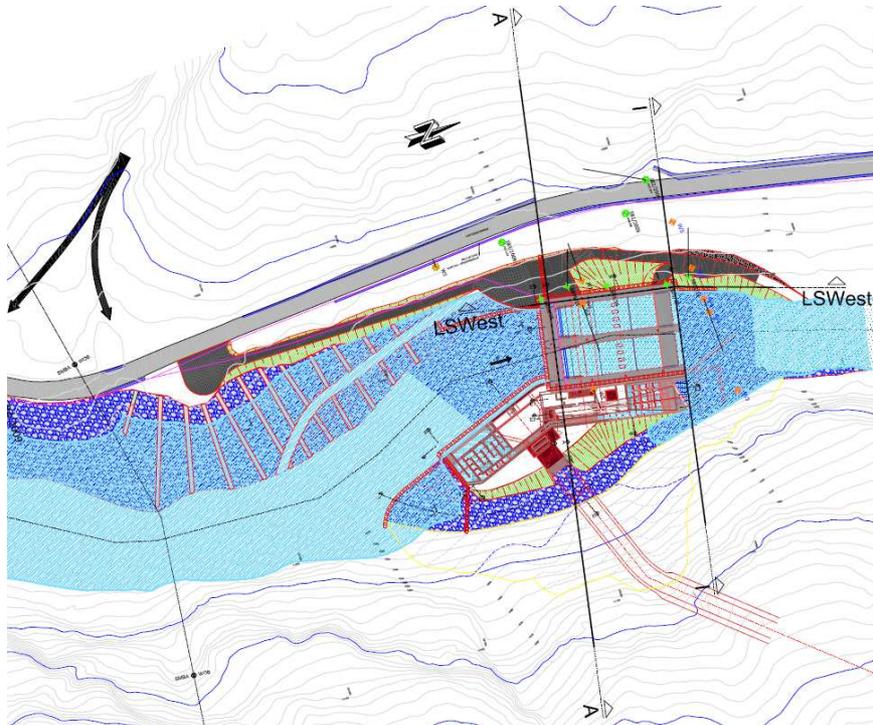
Ground view of an Ovella dam structure with a backwater (on left) and penstocks exiting towards lower right corner
